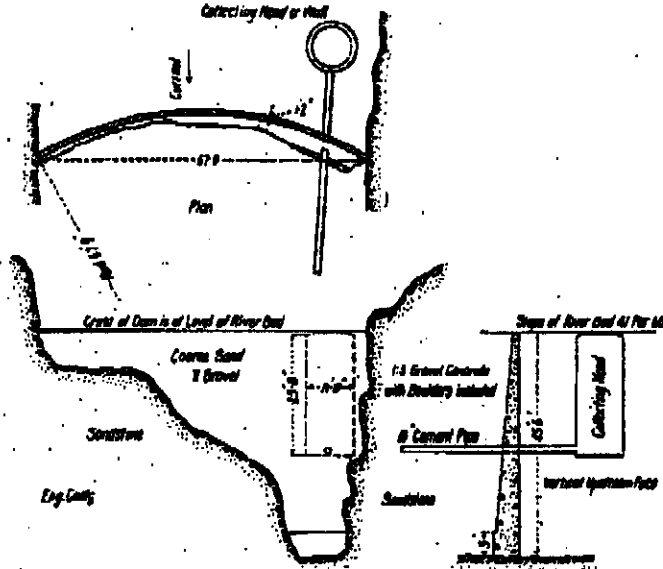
Plan, Profile and Section of Subsurface Dam, Pantano Wash Near Tucson, Ariz.
